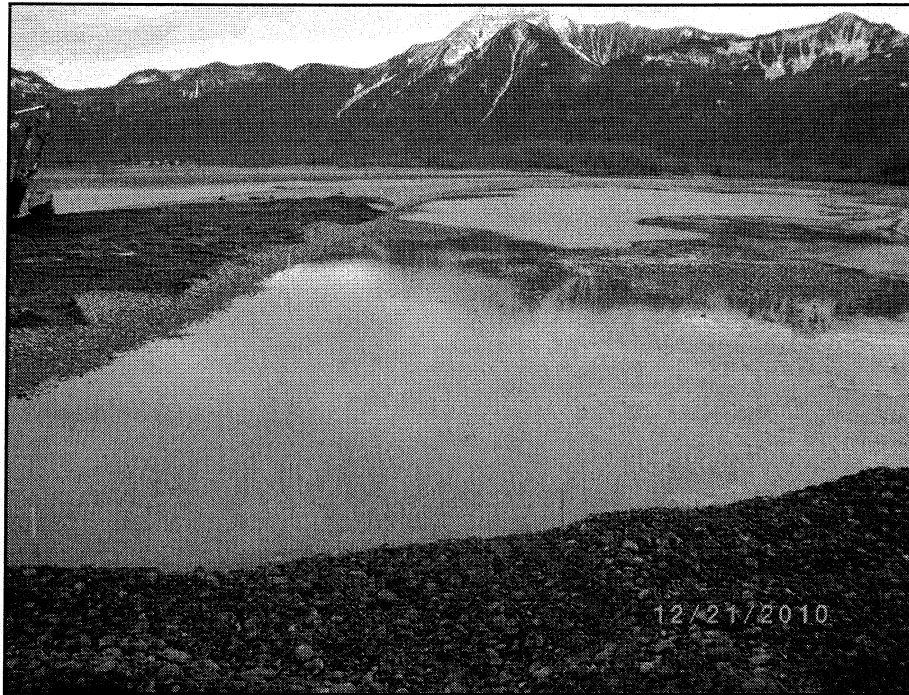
Excavated sediment was placed within the downstream end of the original removal area boundary.
